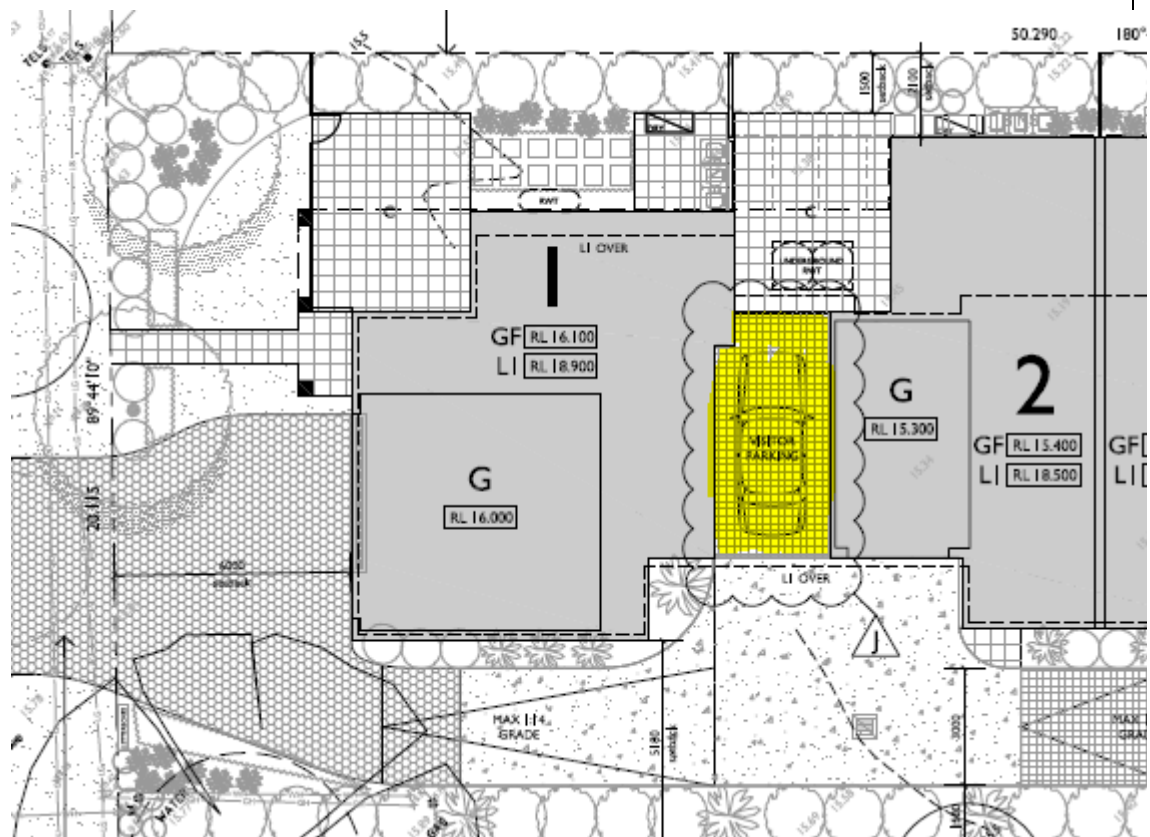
Proposed site layout – visitor car space proposed between Units 1 and 2
